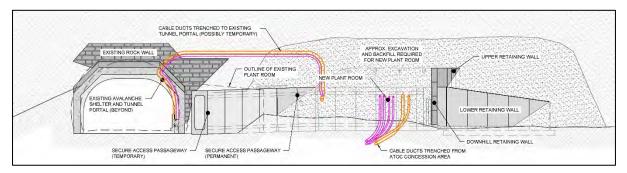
Design drawing of Equipment Building showing proposed east elevation (not to scale).⁵⁹
